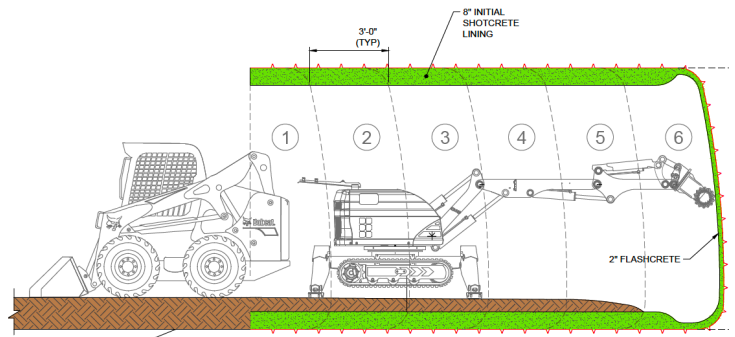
Fish Passage SEM Tunnel Typical Excavation and Support Sequence.
